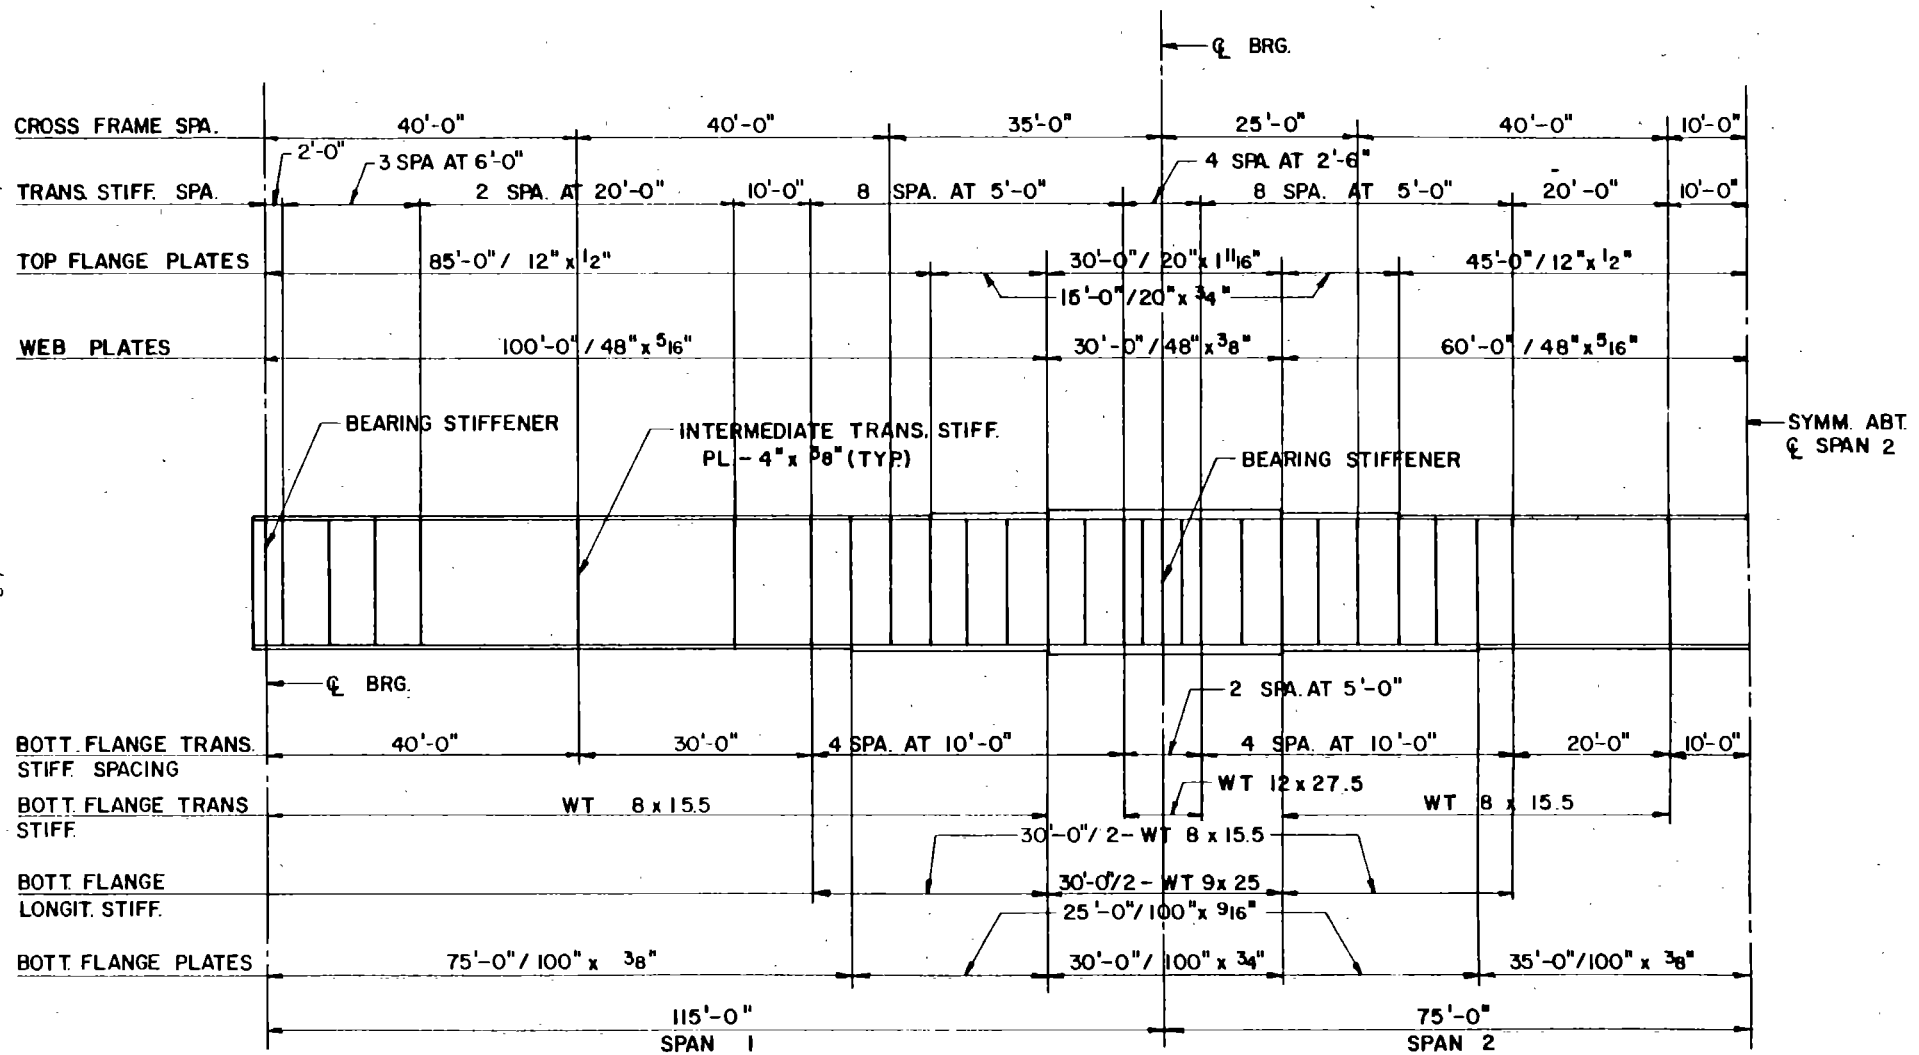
INTERIOR ELEVATION OF TYPICAL GIRDER WEB - AASHTO DESIGN-SHORT SPAN
